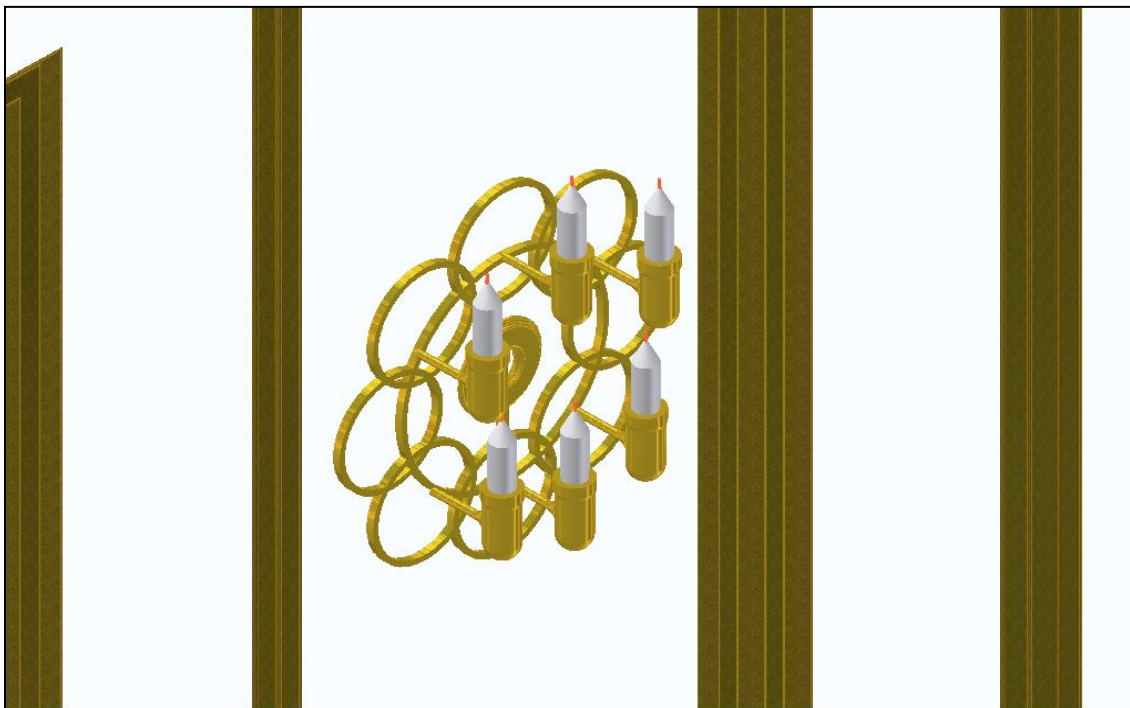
3D View of Wall Mounted Lighting Fixture
